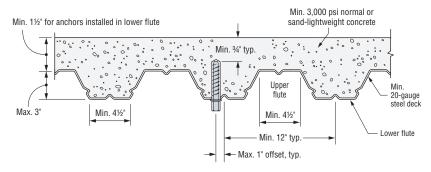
THD50234RH Installation in Concrete over Steel Deck
